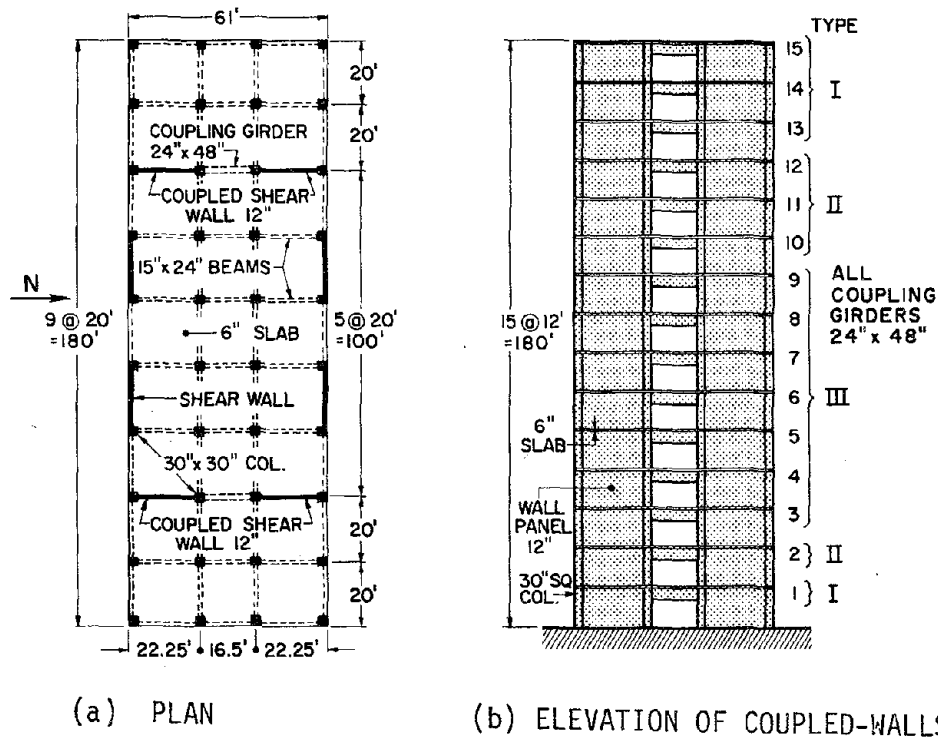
STRUCTURAL LAYOUT OF THE 15-STORY R/C FRAME-COUPLED WALL BUILDING
